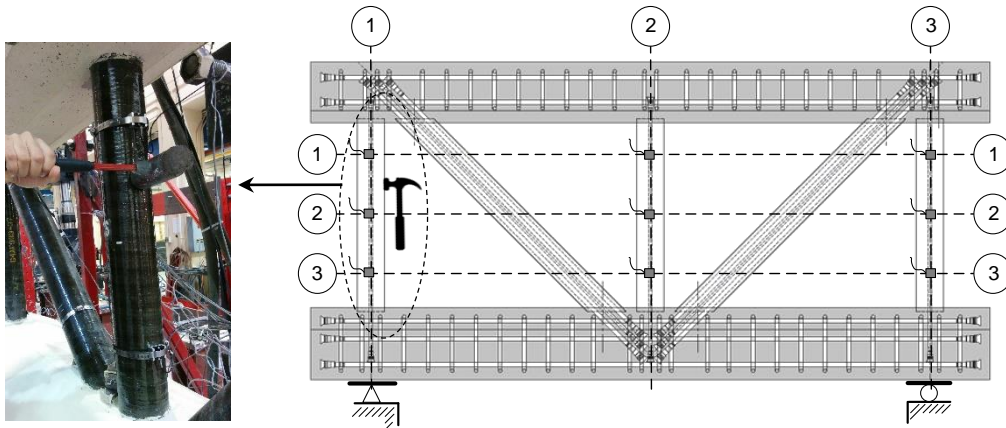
Typical impact tests and sensor arrangement for damage identification in the vertical truss elements
